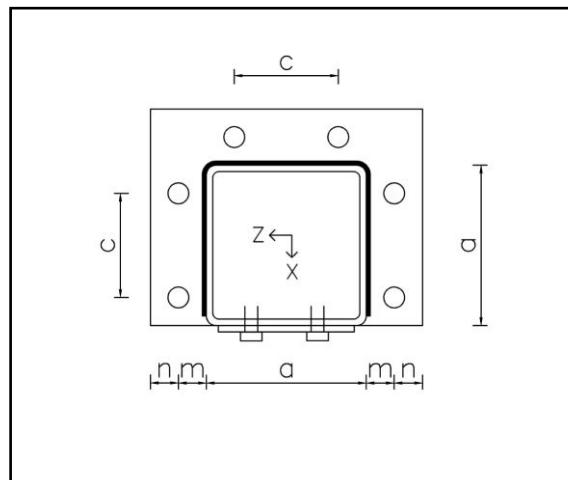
Bolt layout of non-symmetrical intermediate splice connection
